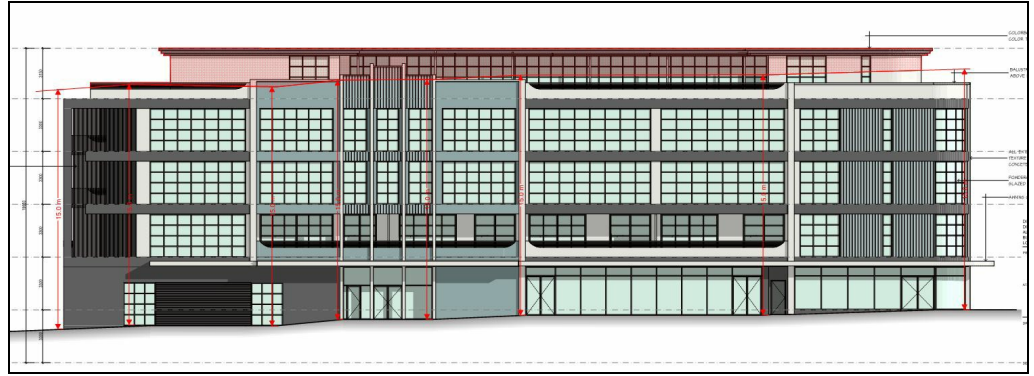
The Harrington Street facade of the subject building. The elements of the proposed building above the compliant 15m height limit can be seen hatched in red at the top of the building.
